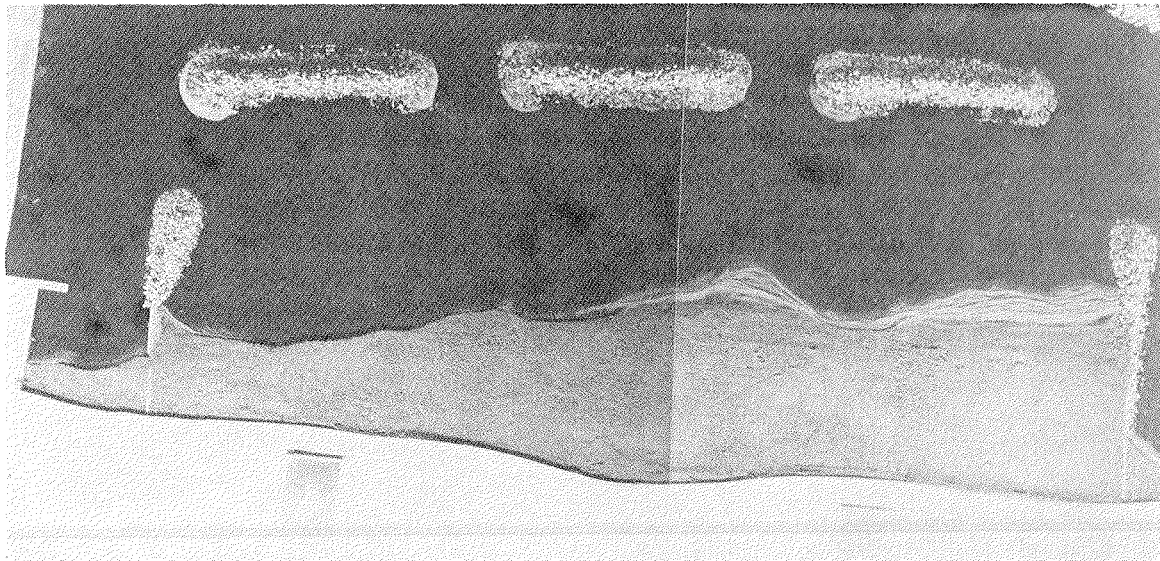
Shoreline in model tests with the Lakeview Park recommended plan of a 30.5-m extension of the west groin (Bottin 1982)
